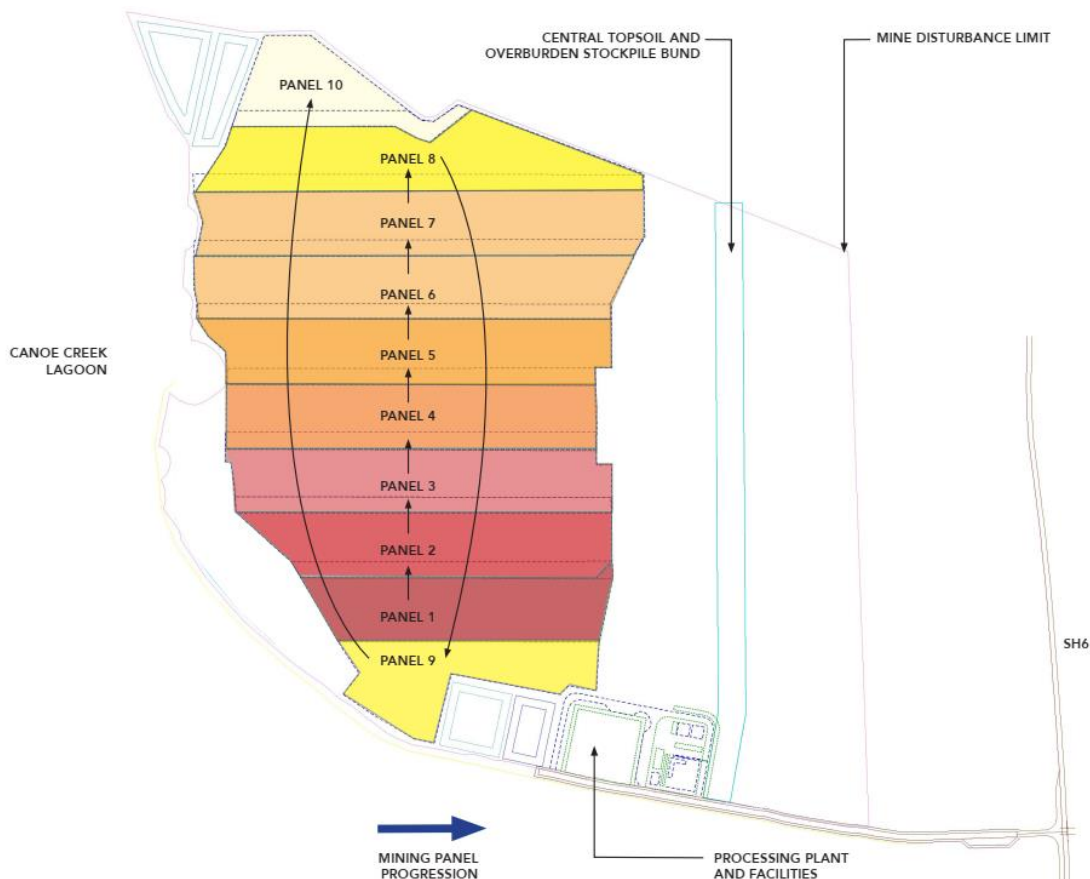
Site plan showing mining progress across the site (From Glasson Huxtable Landscape Architects).
